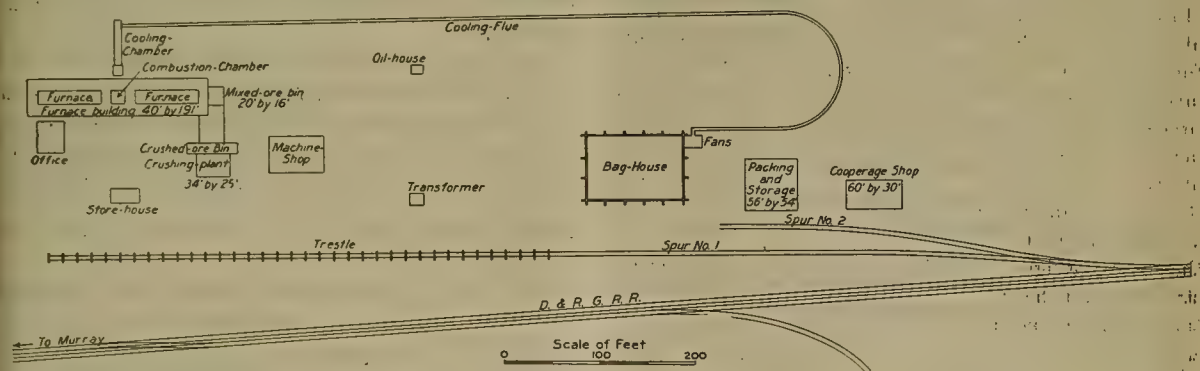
PLAN SHOWING ARRANGEMENT OF THE BUILDINGS
